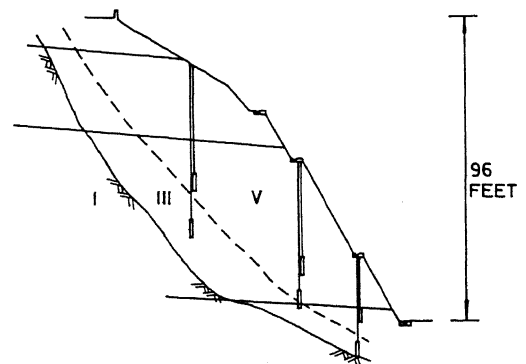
Lower Slope Section Showing Horizontal Drains and Piezometers
